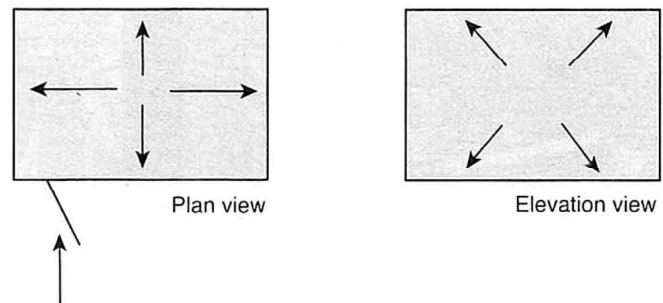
Photographing All Four Walls, the Floor, the Ceiling/Roof, and Both Sides of Each Door.
